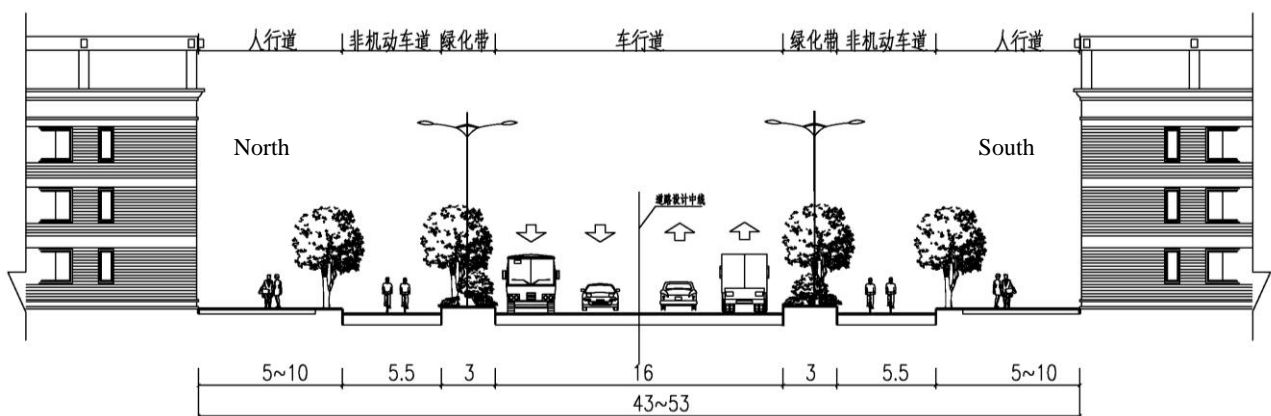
Existing Cross Section of Jiefang Avenue (Binhe Avenue~Jinqiu Avenue)
